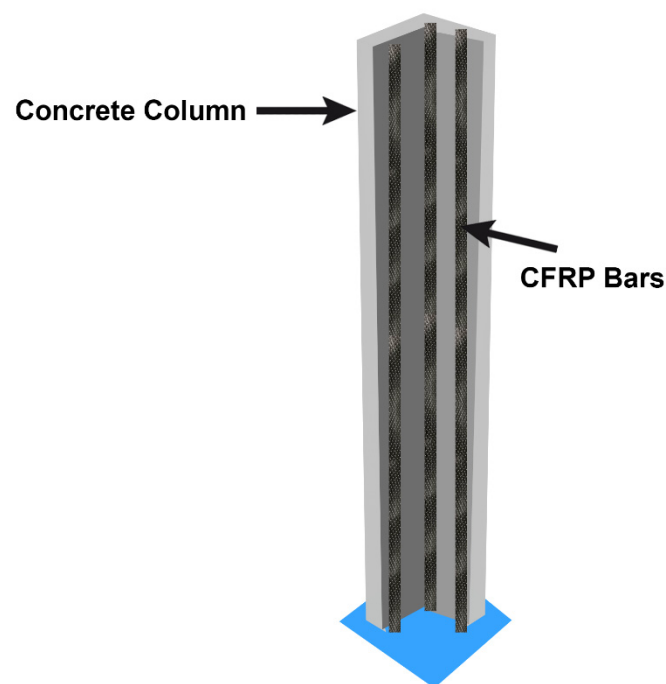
Enhancing strength and durability of concrete columns through CFRP reinforcement for increased load-carrying capacity and resistance to external forces.
